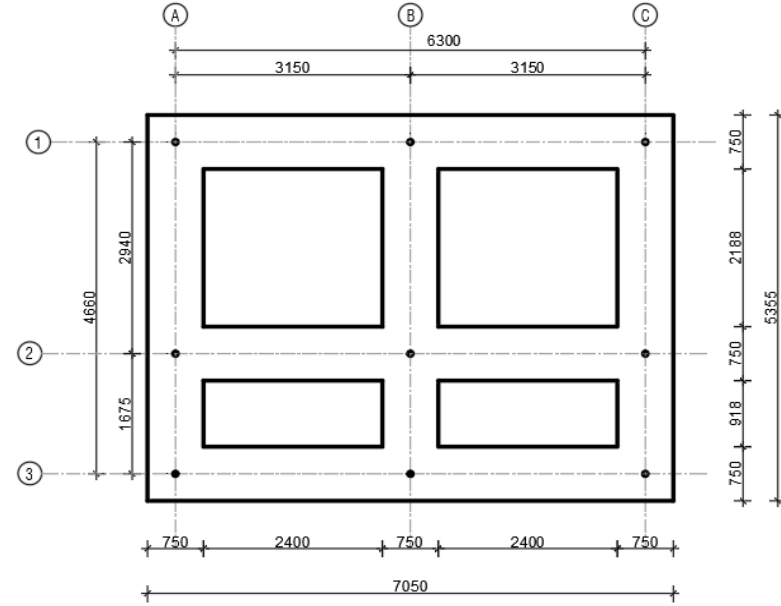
15 Ground Floor Plan (Horizontal Expansion option 1)
